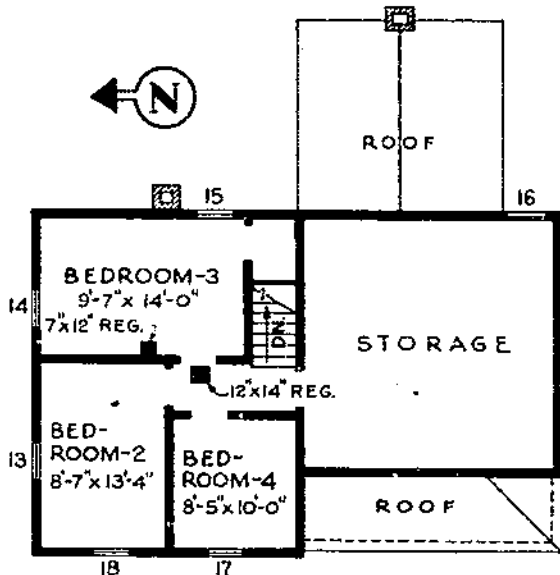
Second-floor plan of house No. 5, showing location of warm-air registers.
